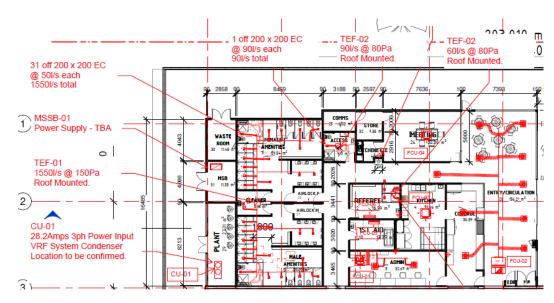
Layout Showing the Location of the Proposed Mechanical Plant to the Northwest of the Site. Source: The Facility Design Group.
